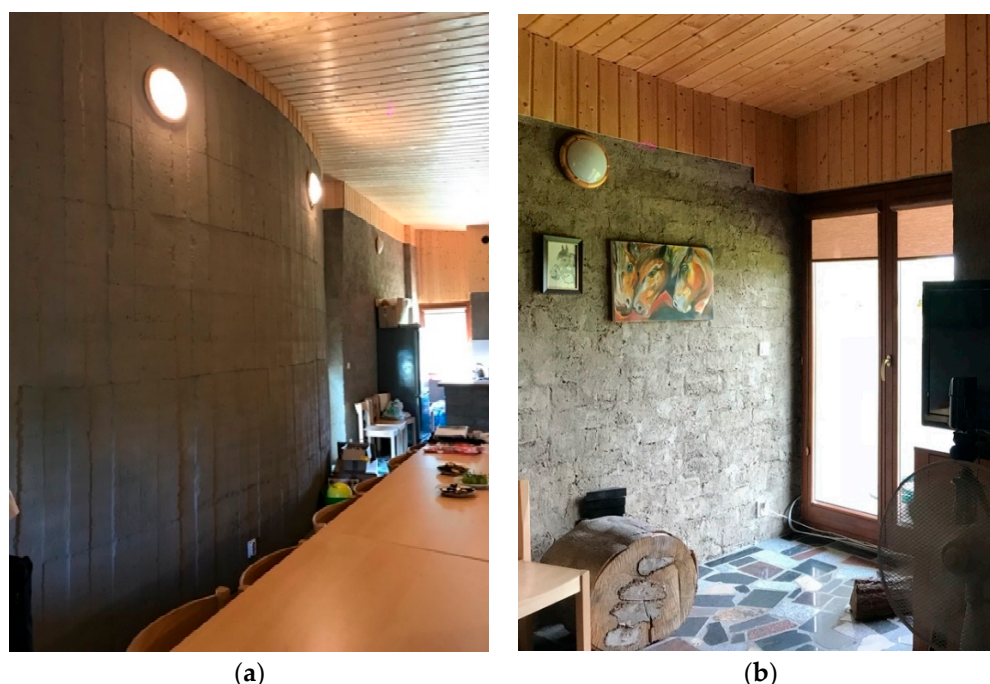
View of the internal wall without any defects. View on accumulation wall between interior and veranda—rammed earth surface. (a) View on layered external wall—straw and clay blocks surface (b). Photos taken during architectural and technical site visit on 1 August 2018.
